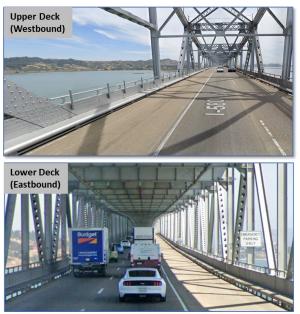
Initial Conditions – Bridge Upper and Lower Decks
